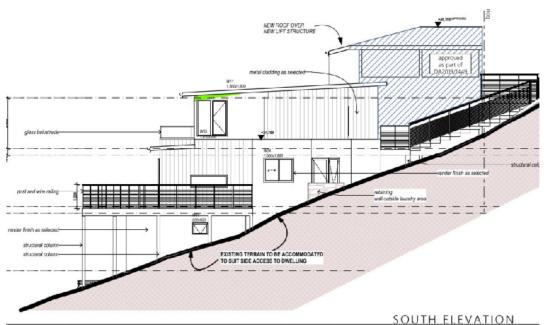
Proposed building envelope non-compliance on southern elevation (highlighted in green).
